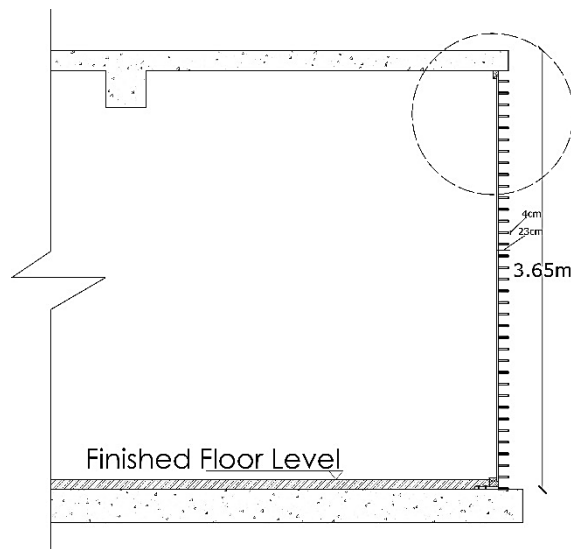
Section showing horizontal louvers attached to the west façade of typical model
